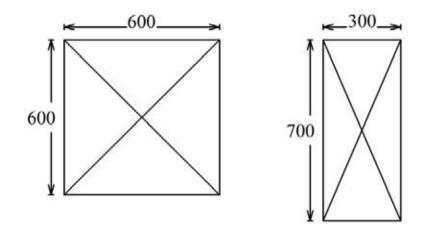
cross-section of columns and beams for sawn wood model, in mini meter
